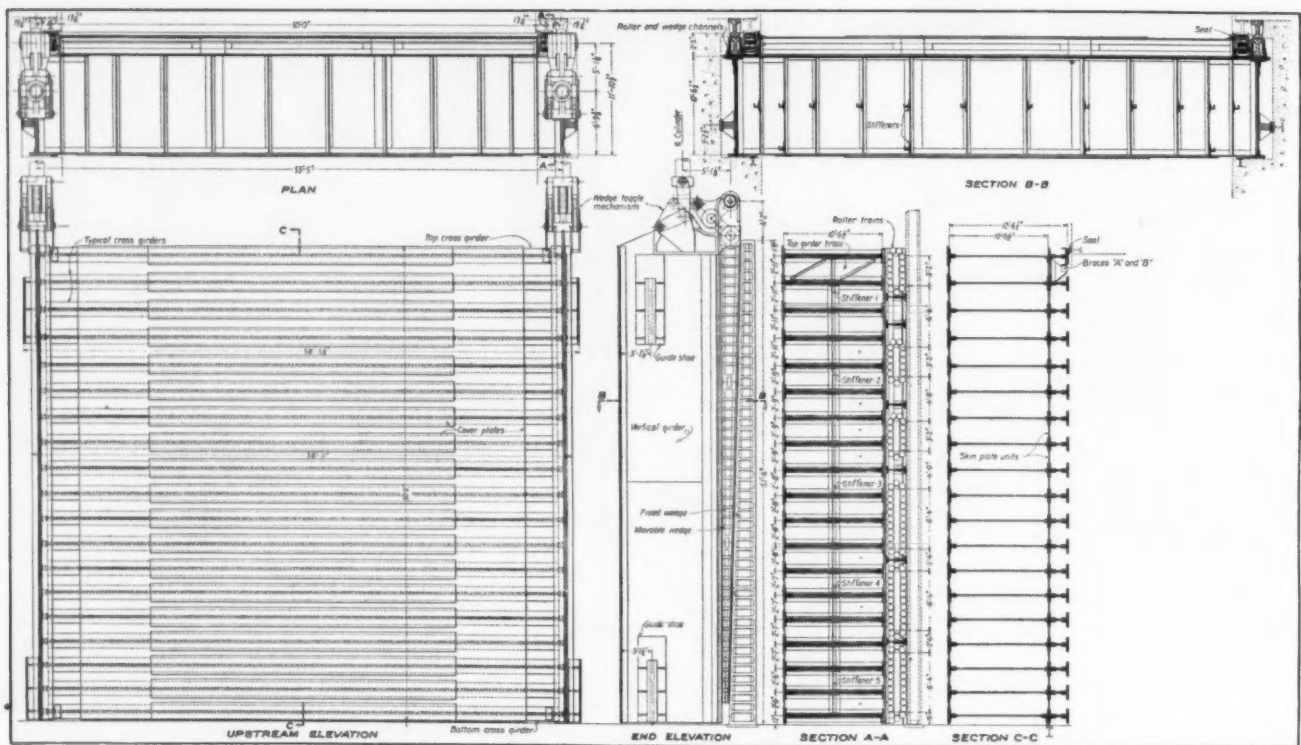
GATE-LEAF ASSEMBLY AND SECTIONS
